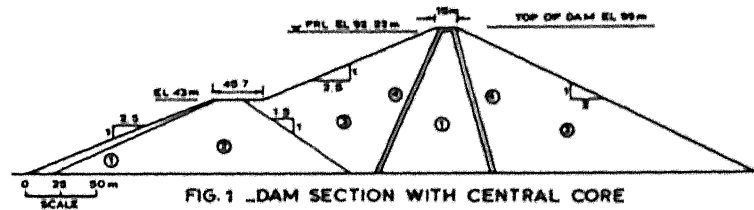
DAM SECTION WITH CENTRAL CORE
